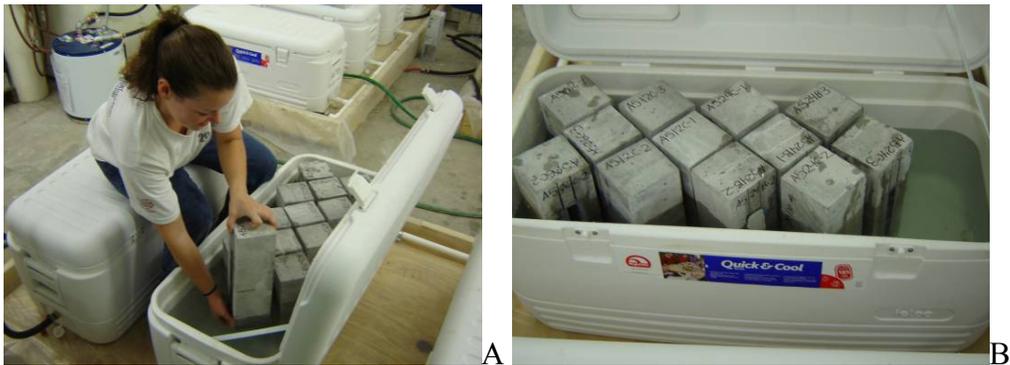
24. Addition of beams to exposure tanks. A) Installation of beams in tank B) Placement of beams in tank
